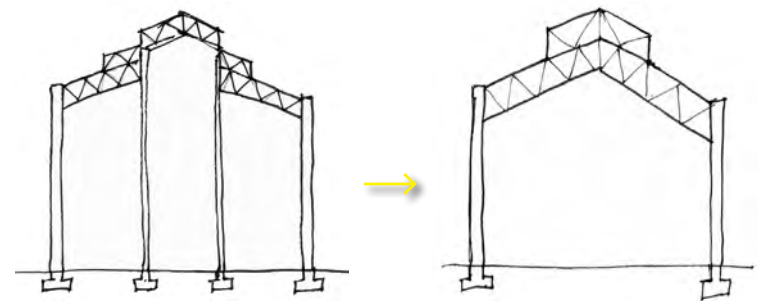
(a),(b) Diagram and sketches showing the new roof for the existing building.
